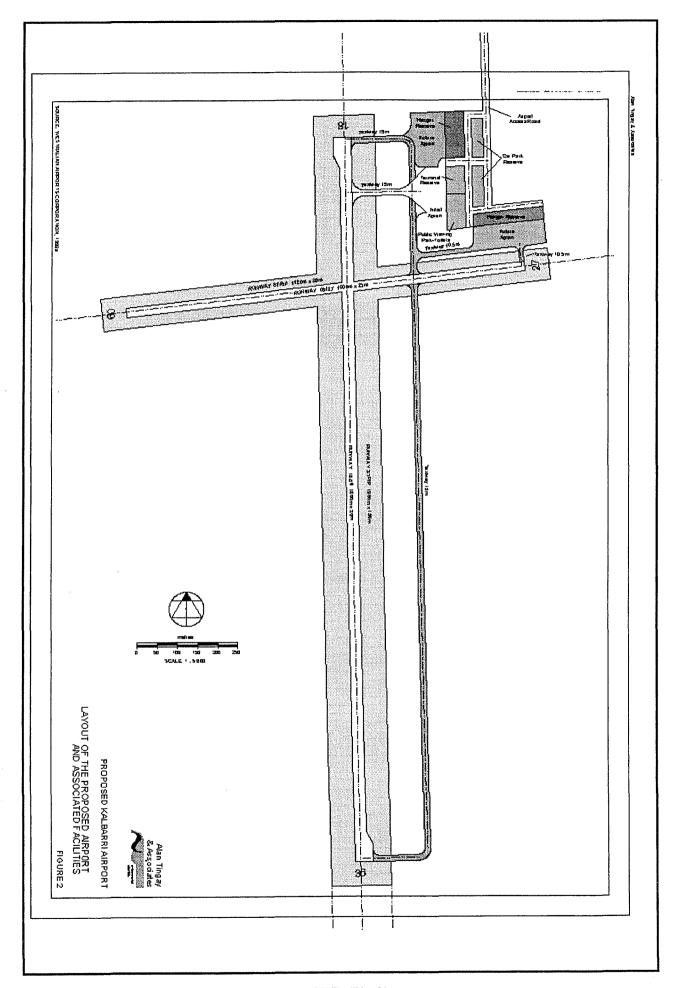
Site plan of the proposal (Source: CER, Fig.2).
